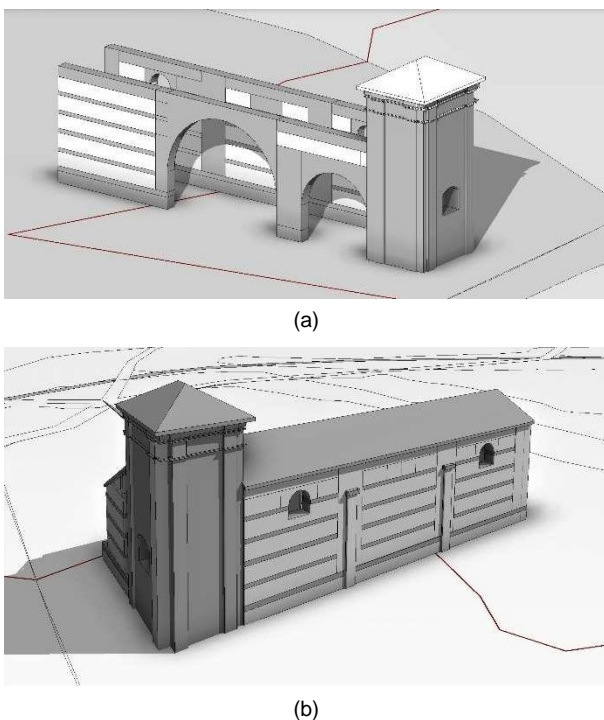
3D volume of the HBIM LOK 200: (a) Interior space beam area; and (b) Exterior space beam area. These images show the building systems.
